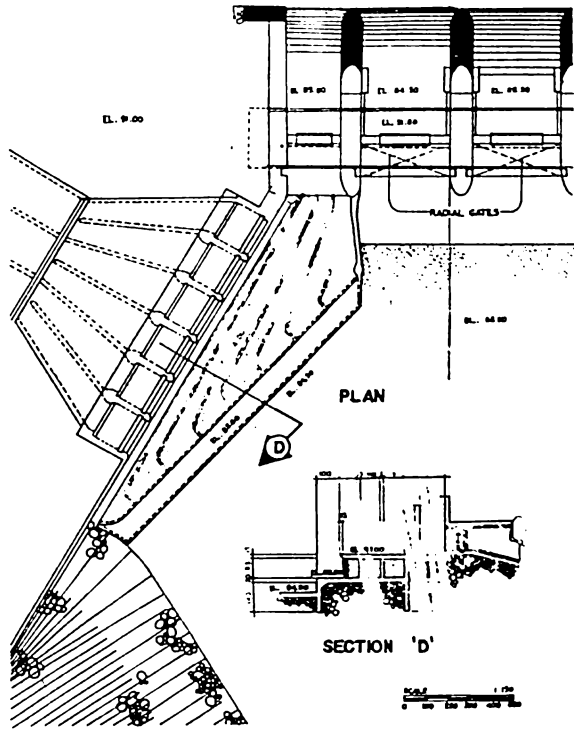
Proposed Tunnel-Type Sediment Diverter for the Sto. Tomas Diversion Works
